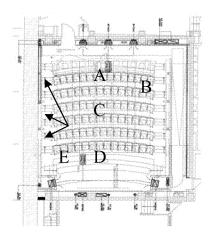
Ground floor plan of the multimedia room, with the stage of the bottom of the plan and diffusers distributed along the three others sides of the room.
